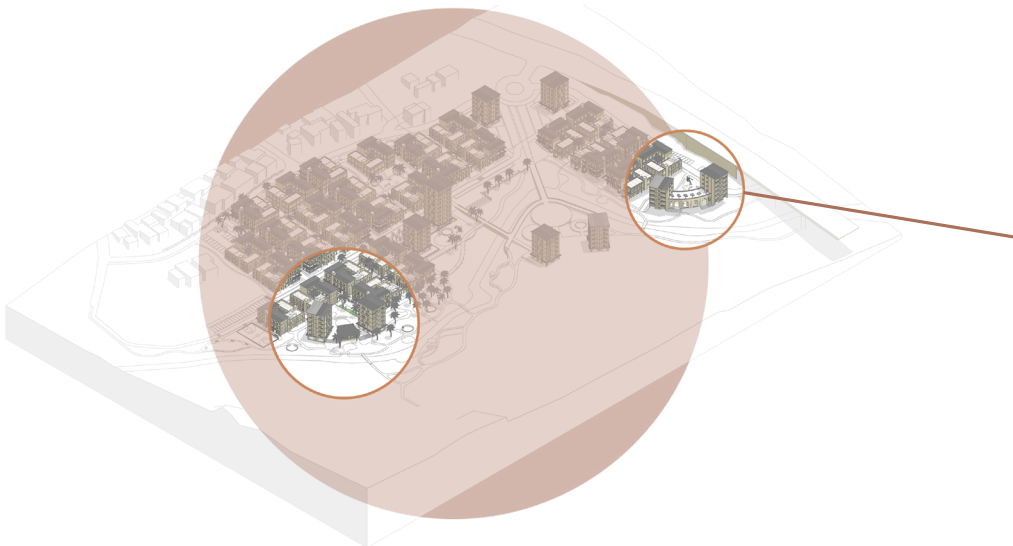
Location of “Dwelling Tower” within the Masterplan
